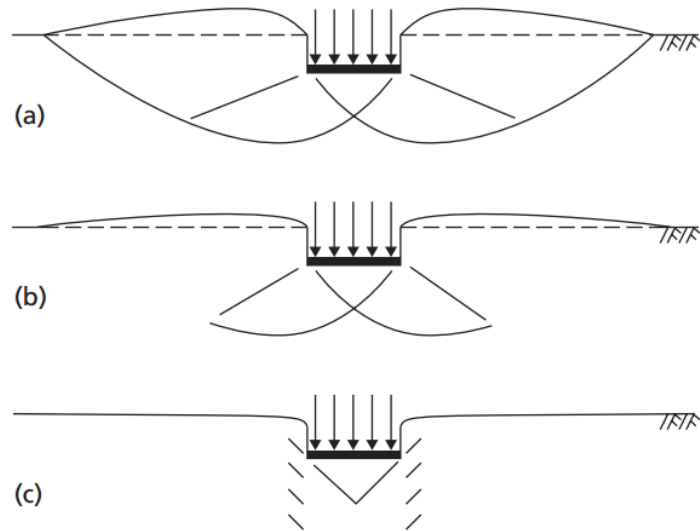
Modes of shear failure; (a) general failure (b) local failure (c) punching failure, (Knappett and Craig 2012).
